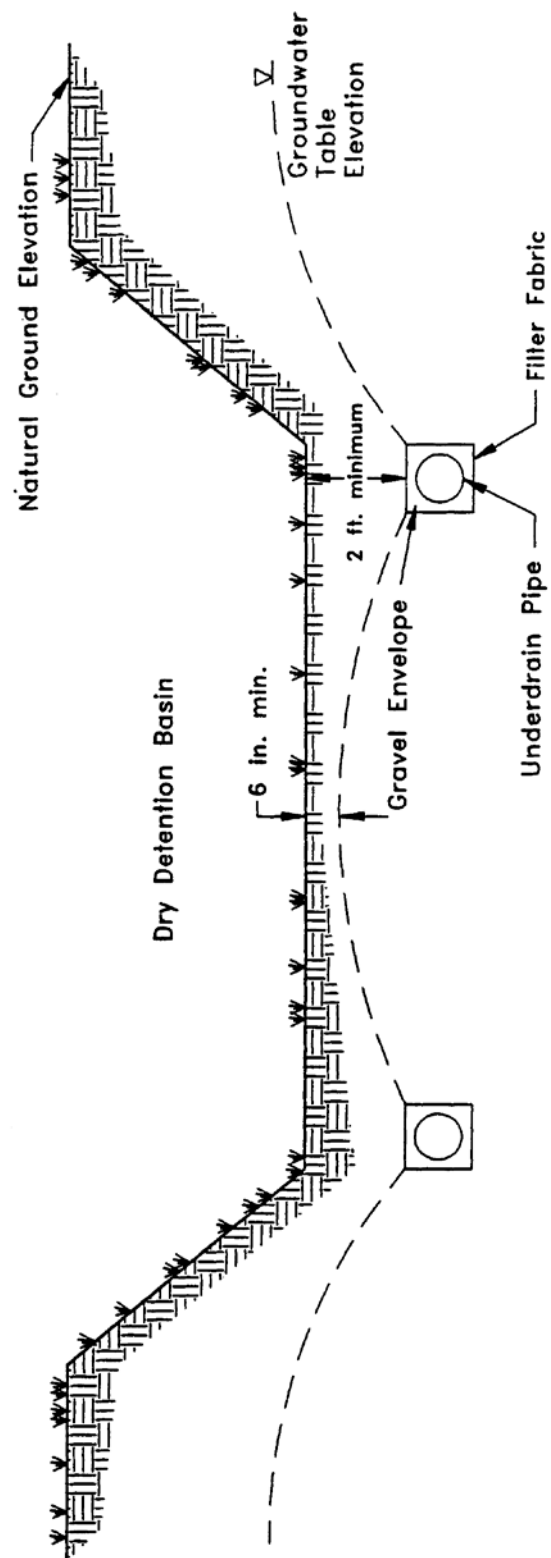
Cross-section of underdrain system (N.T.S.)
